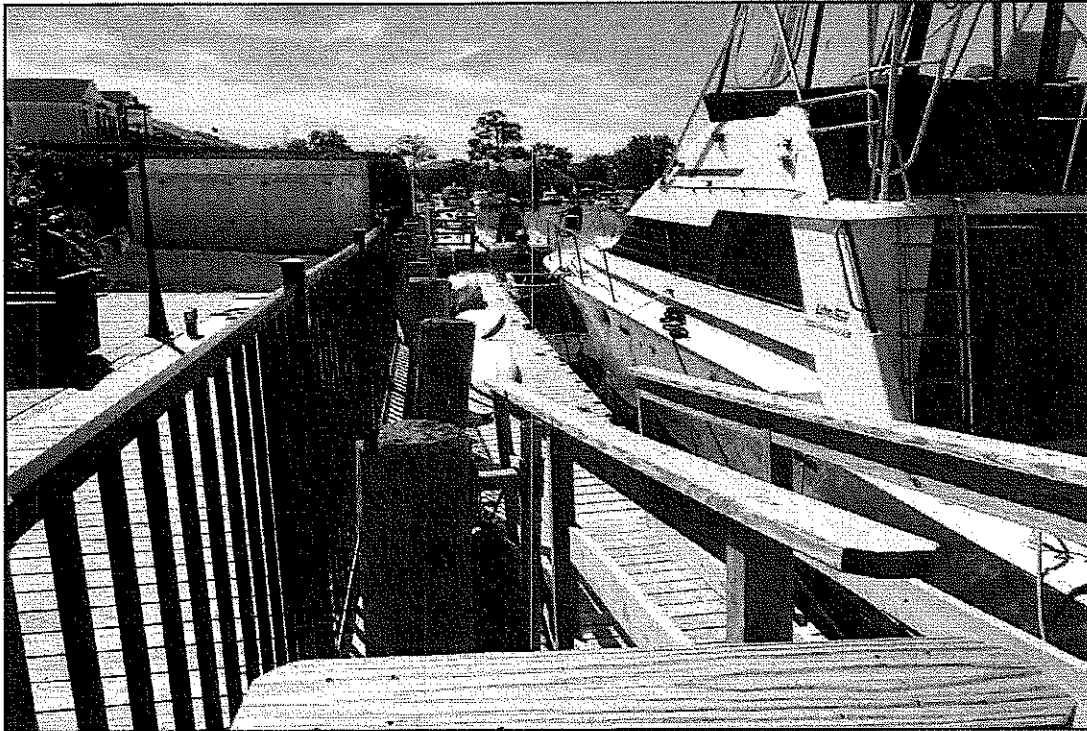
Access gangway leading to floating dock from overwater platform, looking south.
